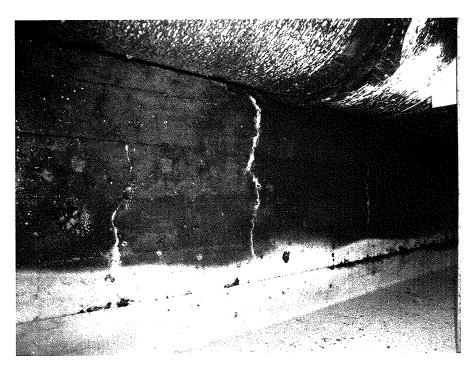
Moisture and Cracking with Efflorescence near Previously Patched Area on the Underside of Deck
